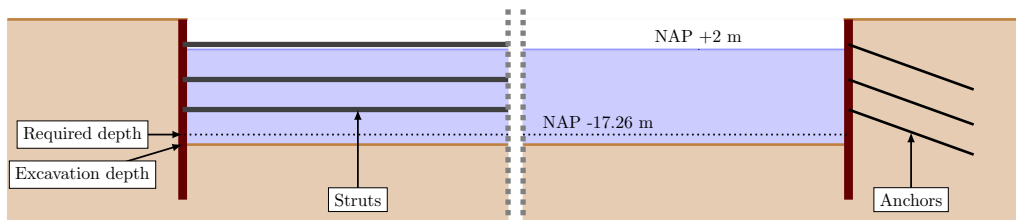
Further excavation of the building pit and installation of extra layers of struts (left) or anchors (right)
